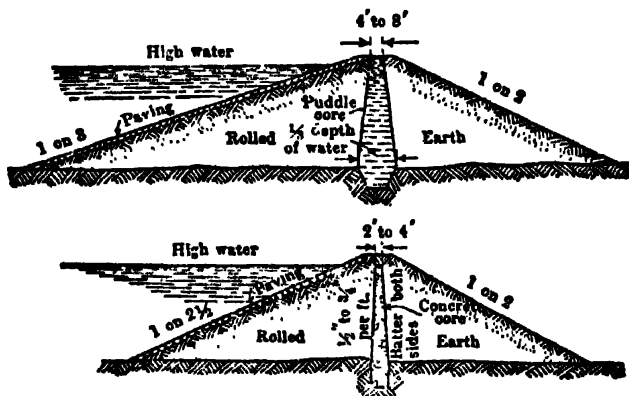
Puddle and Concrete Core-walls for Earth Dams
